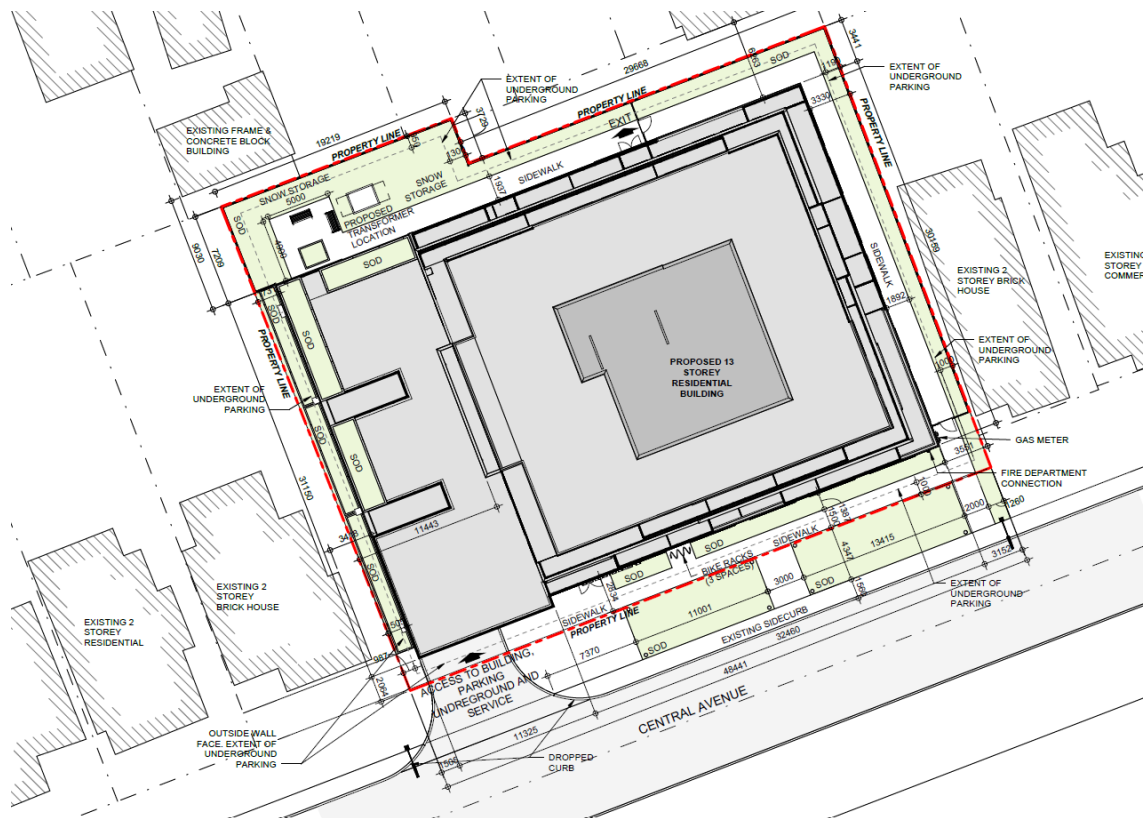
Proposed Site Plan prepared by SRM Architects Inc.
